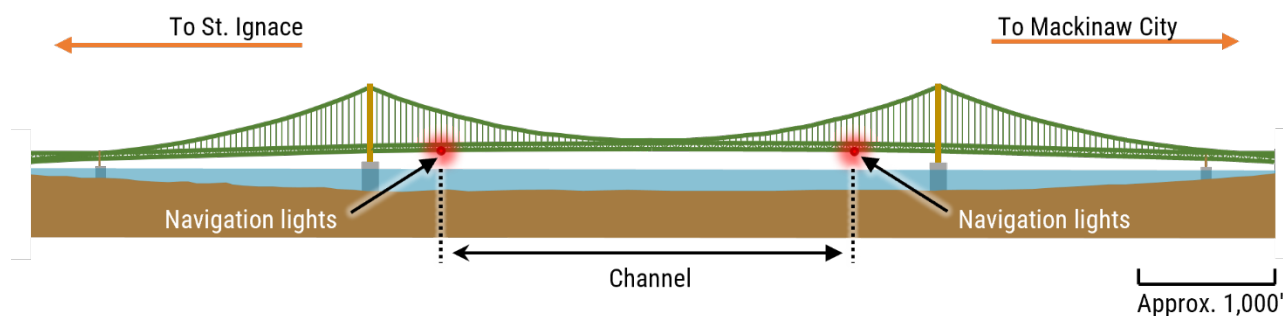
Diagram of the west elevation of the Mackinac Bridge.
